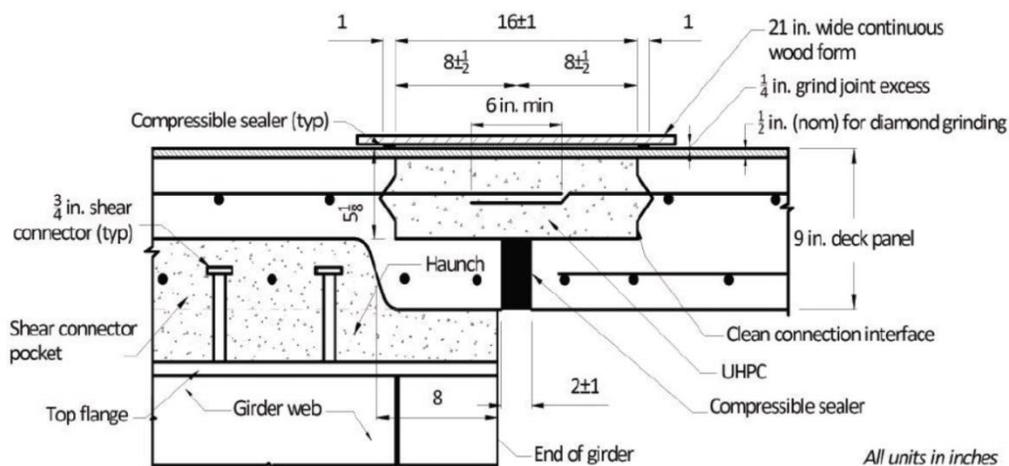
Example UHPC link slab detail used on a bridge project in Owego, NY, shown as a split section with the left side showing details at the girder line and right side showing details midway between girders (Graybeal, 2014)
